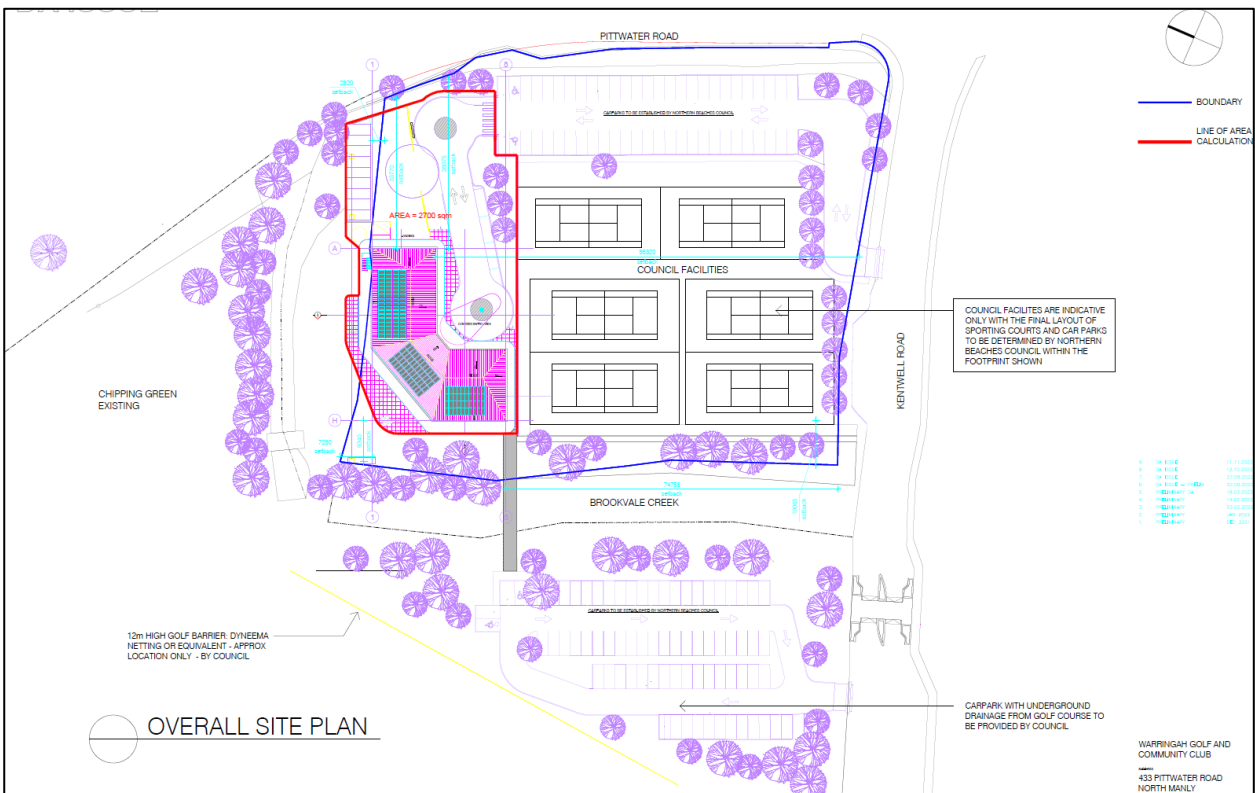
Proposed future development site plan of the golf clubhouse, APU location outlined in red (source: Northern Beaches Council; Attachment B)
